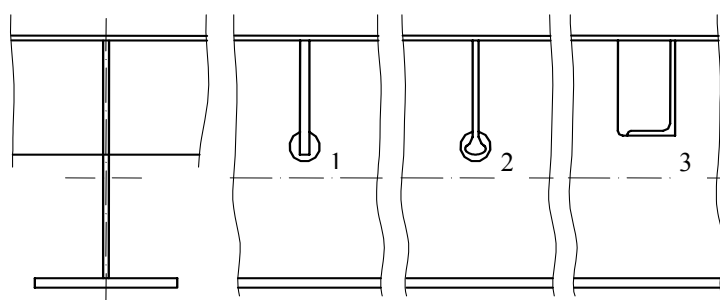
Crossbeam connections with continuous open stiffeners
